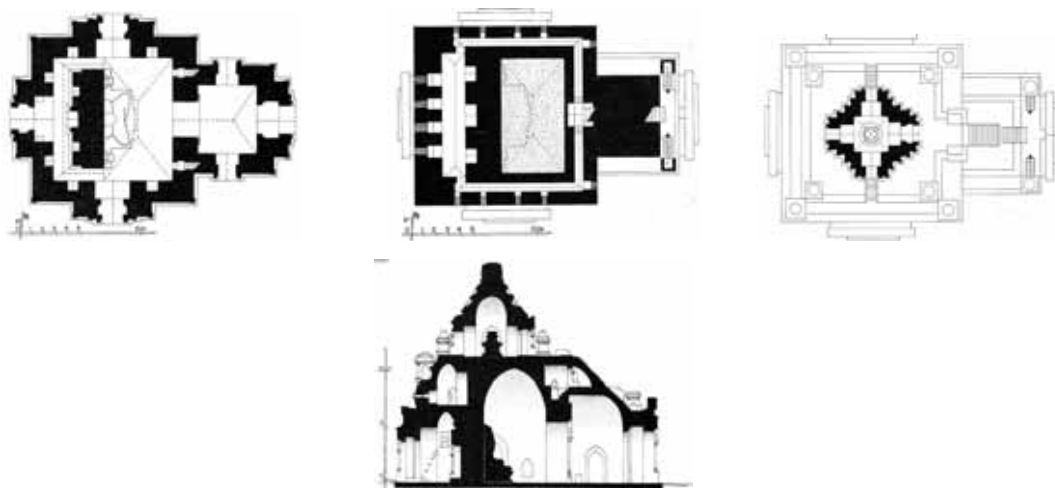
Ground floor plan, first floor plan, upper floor plan and cross section of Kya-Sin temple
